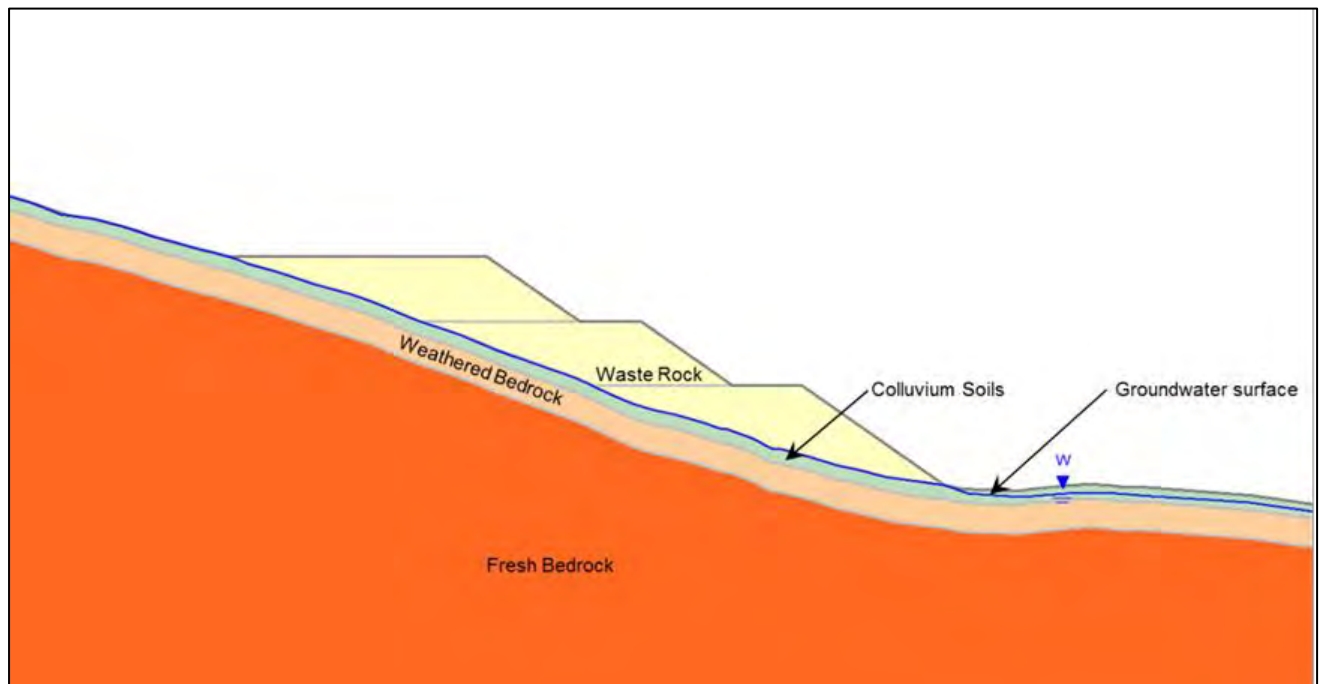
Slope Stability Cross Section Model (PG-M6-SE-C03)
